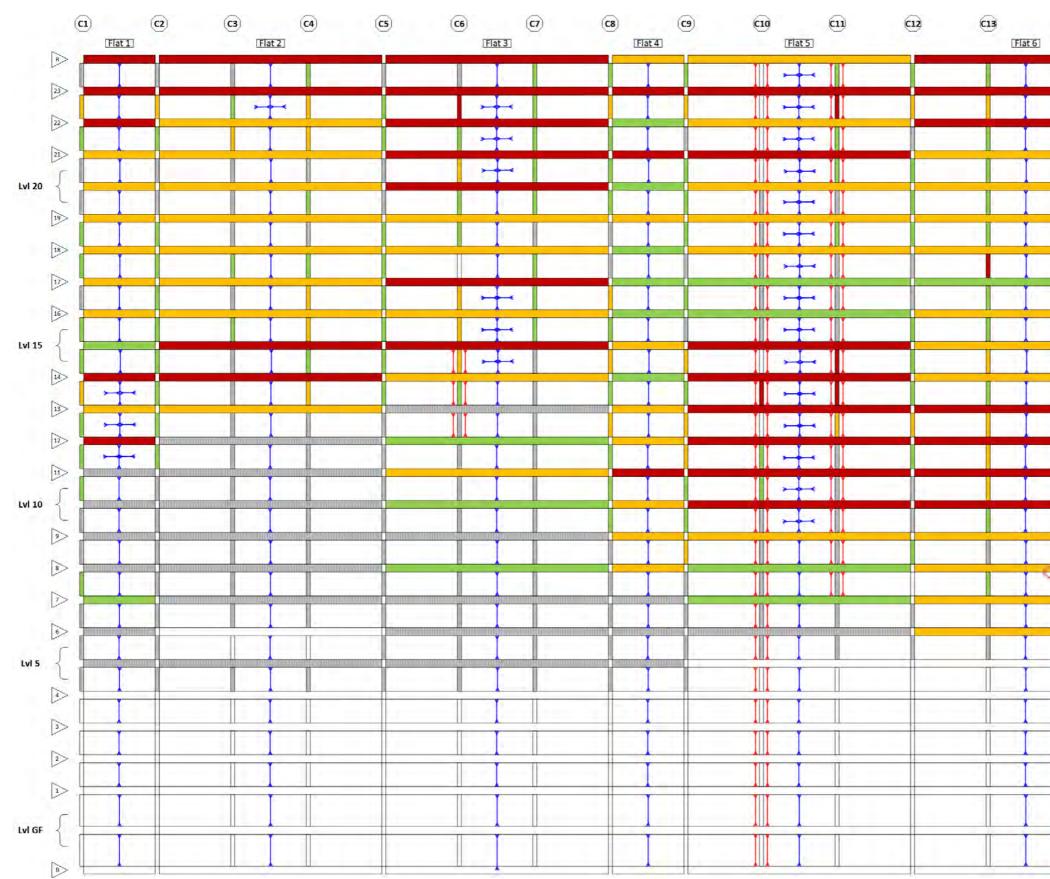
Unwrapped section showing propping and the damage classification for slab soffits and columns as recorded by RSK
